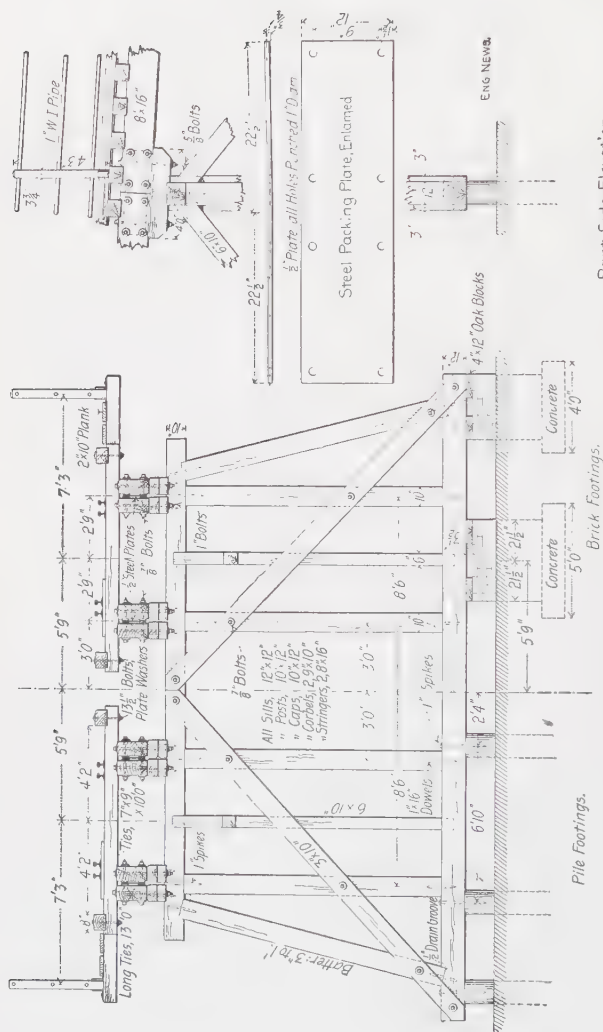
Details of Bent Used in Trestle at Long Beach, N. J., for the Atlantic Highlands, Red Bank, and Long Branch Electric Railway.
